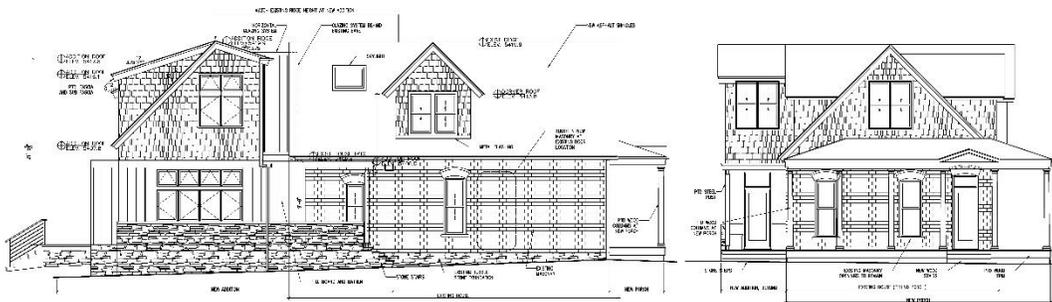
Landmark Alteration Certificate renderings showing the south façade and west elevation of the house and proposed addition.
